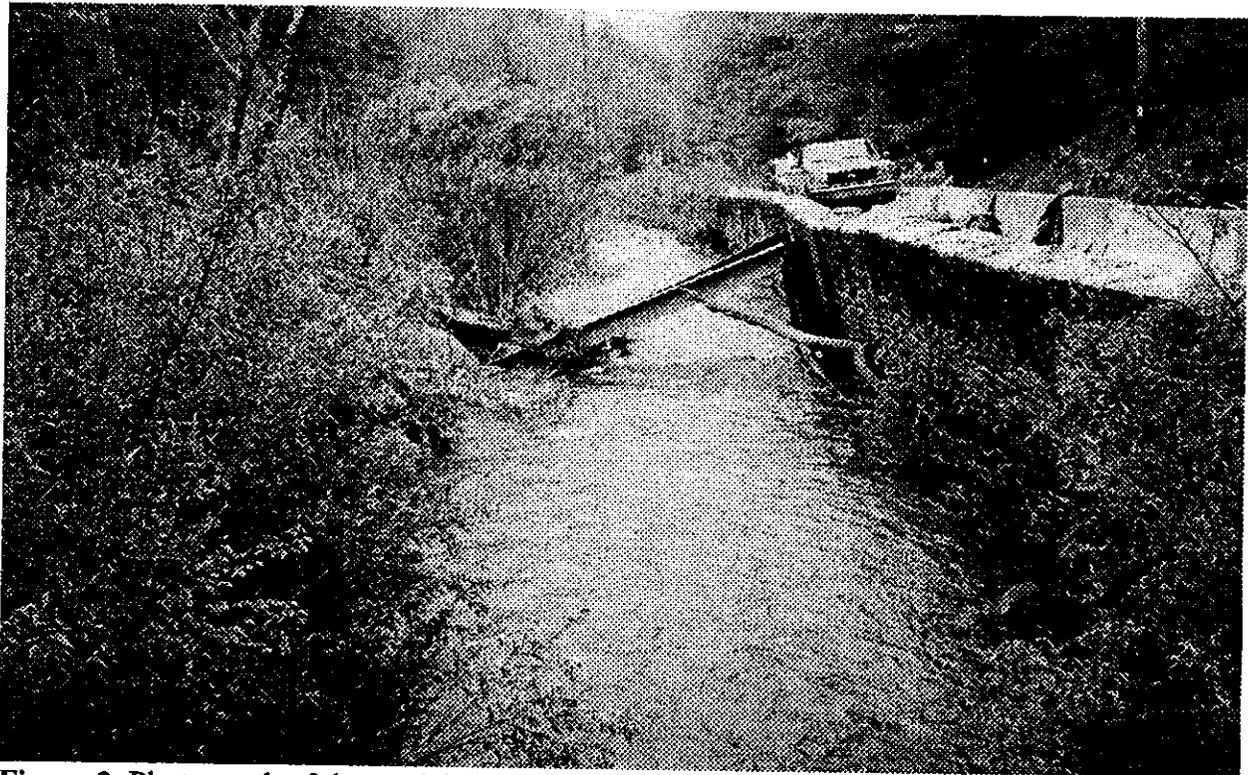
Photograph of the retaining wall facing downstream on North Branch Basket Creek.
